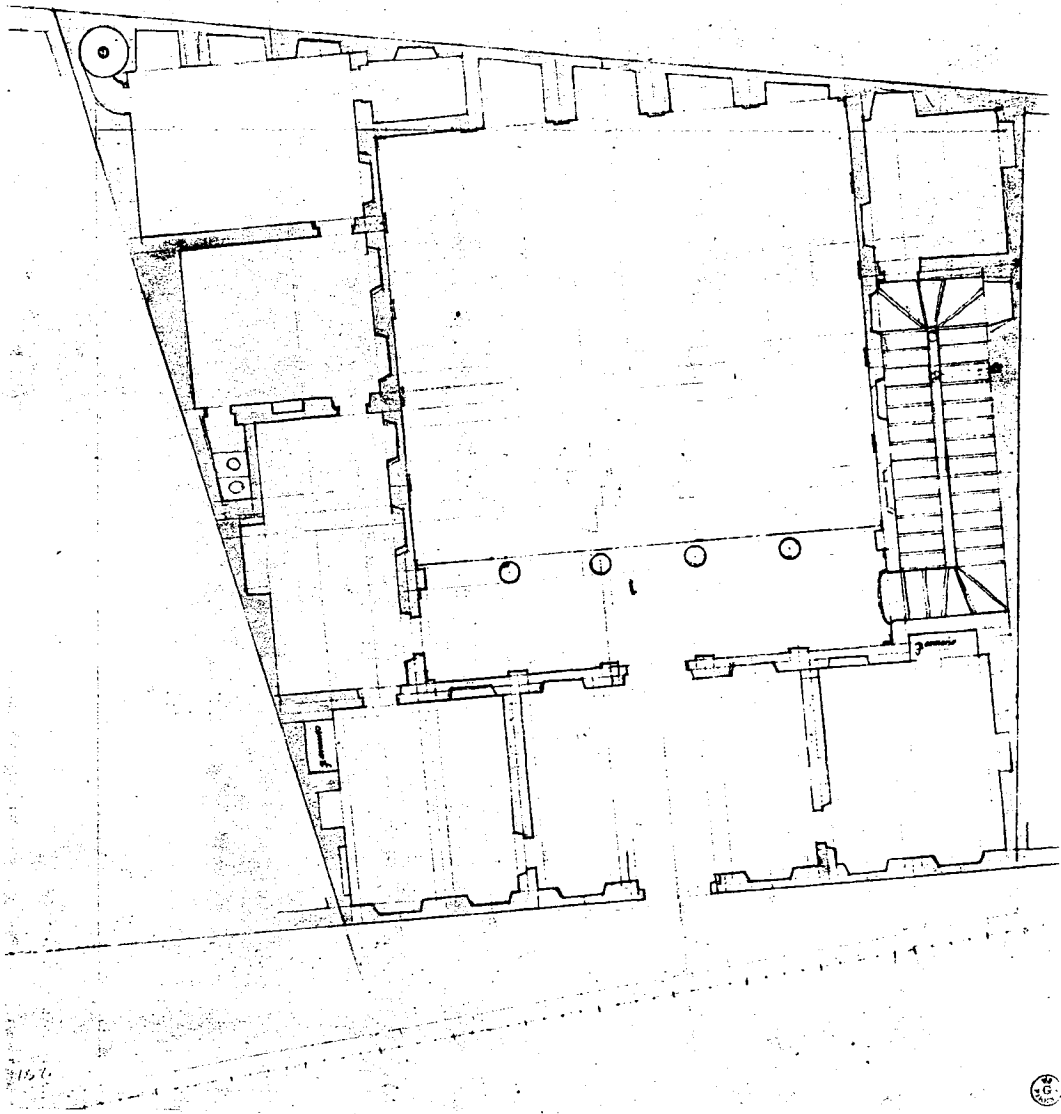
Baldassare Peruzzi: plan for Palazzo Ricci (Uffizi 595)
